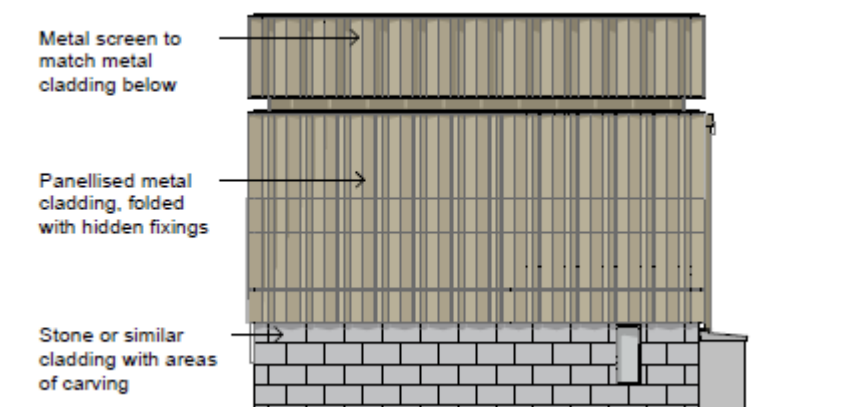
B: East Elevation of the Ballantrae Place Building (source: Studio Pacific Architecture)
